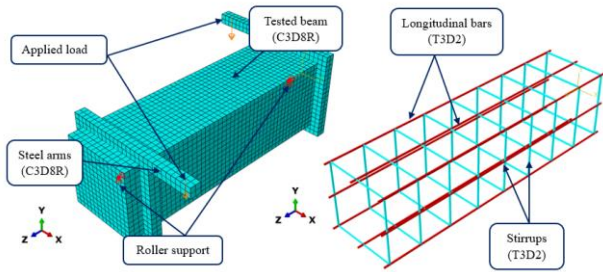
Model set-up: (a) Concrete elements type, loading, and boundary condition, and (b) Types of steel elements.
